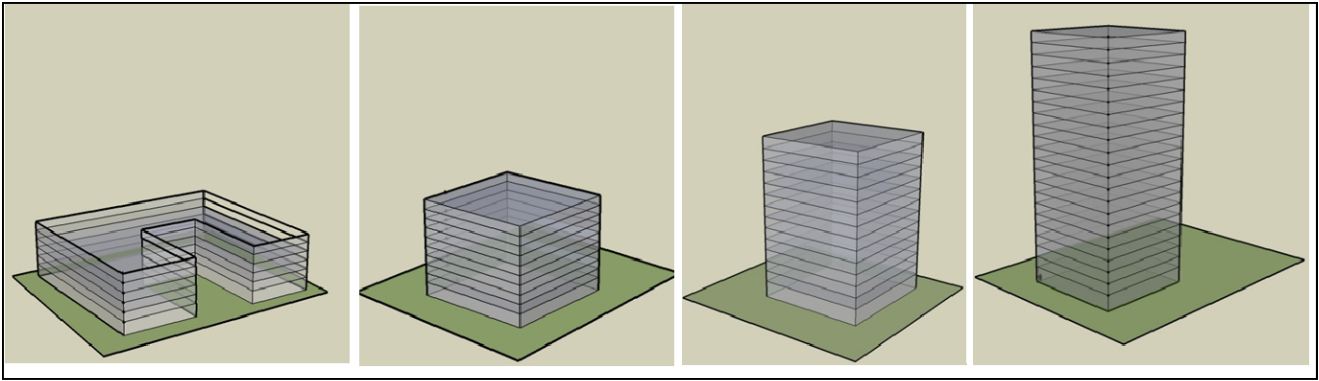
The floor plate of buildings will decrease as the height of the building increases.
